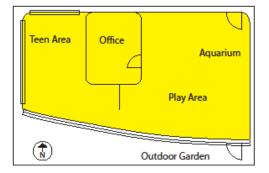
New Hanover Regional Play Room Plan. Not to scale.
